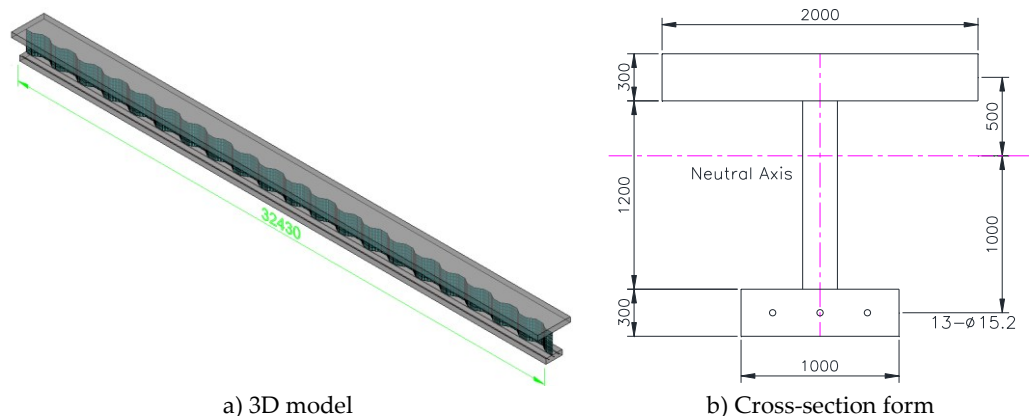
Composite beam with Corrugated steel web model (Unit: mm)
